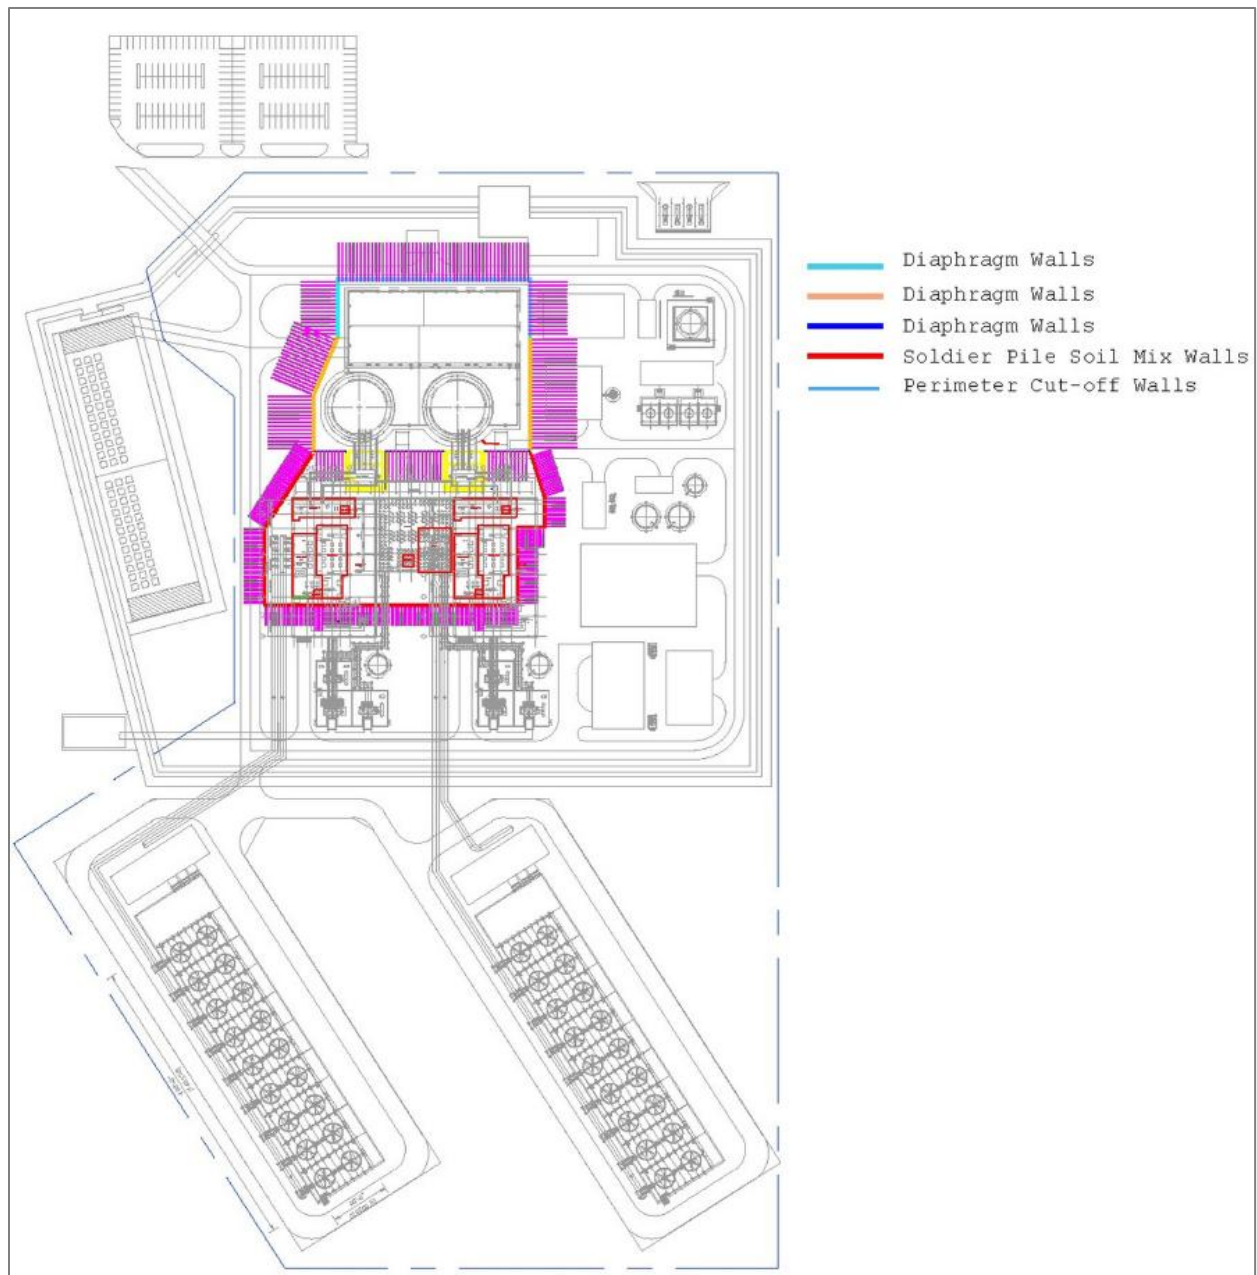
Layout of Proposed Support of Excavation Walls for the Pioneer Units 1 and 2 Site. Source: PSMR 2025-TN12930.
